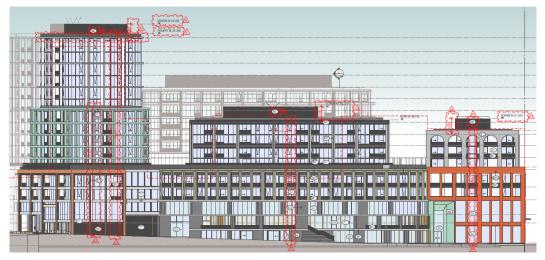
Current amendment Nelmoore Lane (southern) elevation
